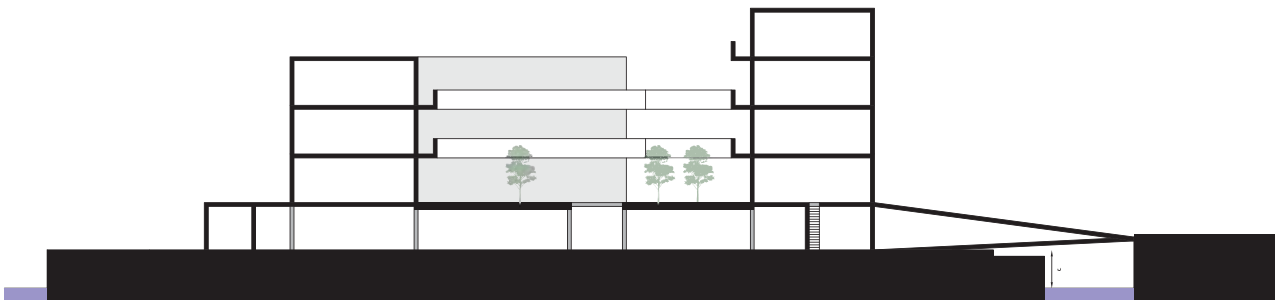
Section of variant 2: basement is fully elevated (by author)
